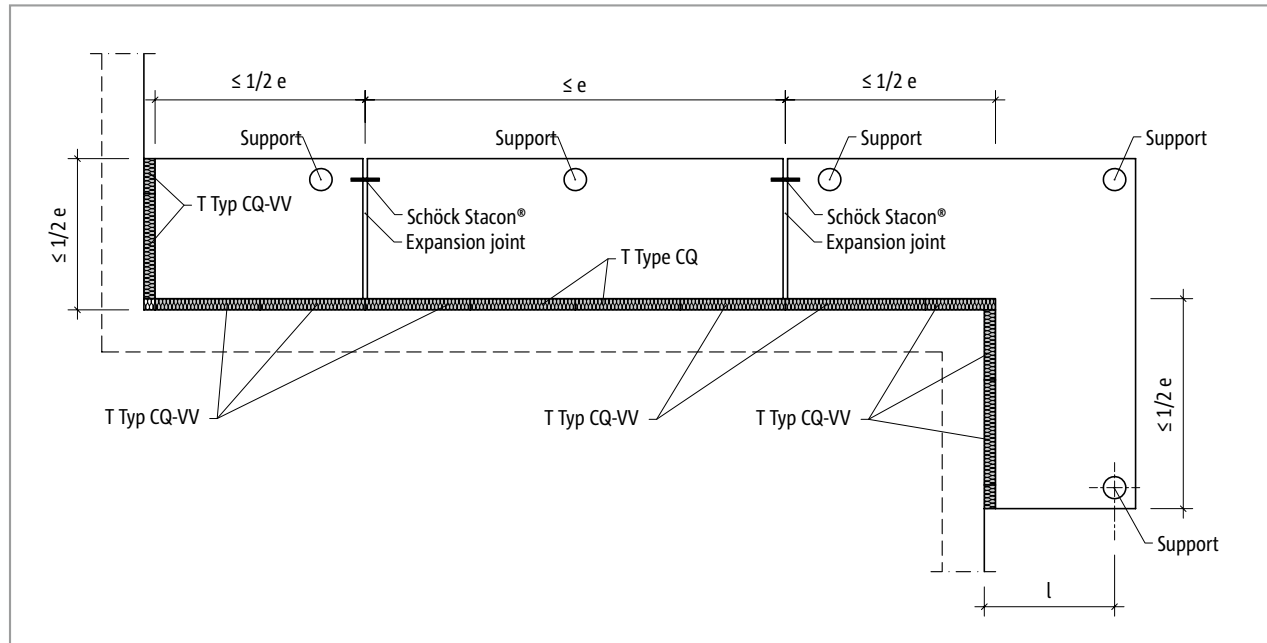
Schöck Isokorb® T Type CQ, CQ-VV: Expansion joint layout
